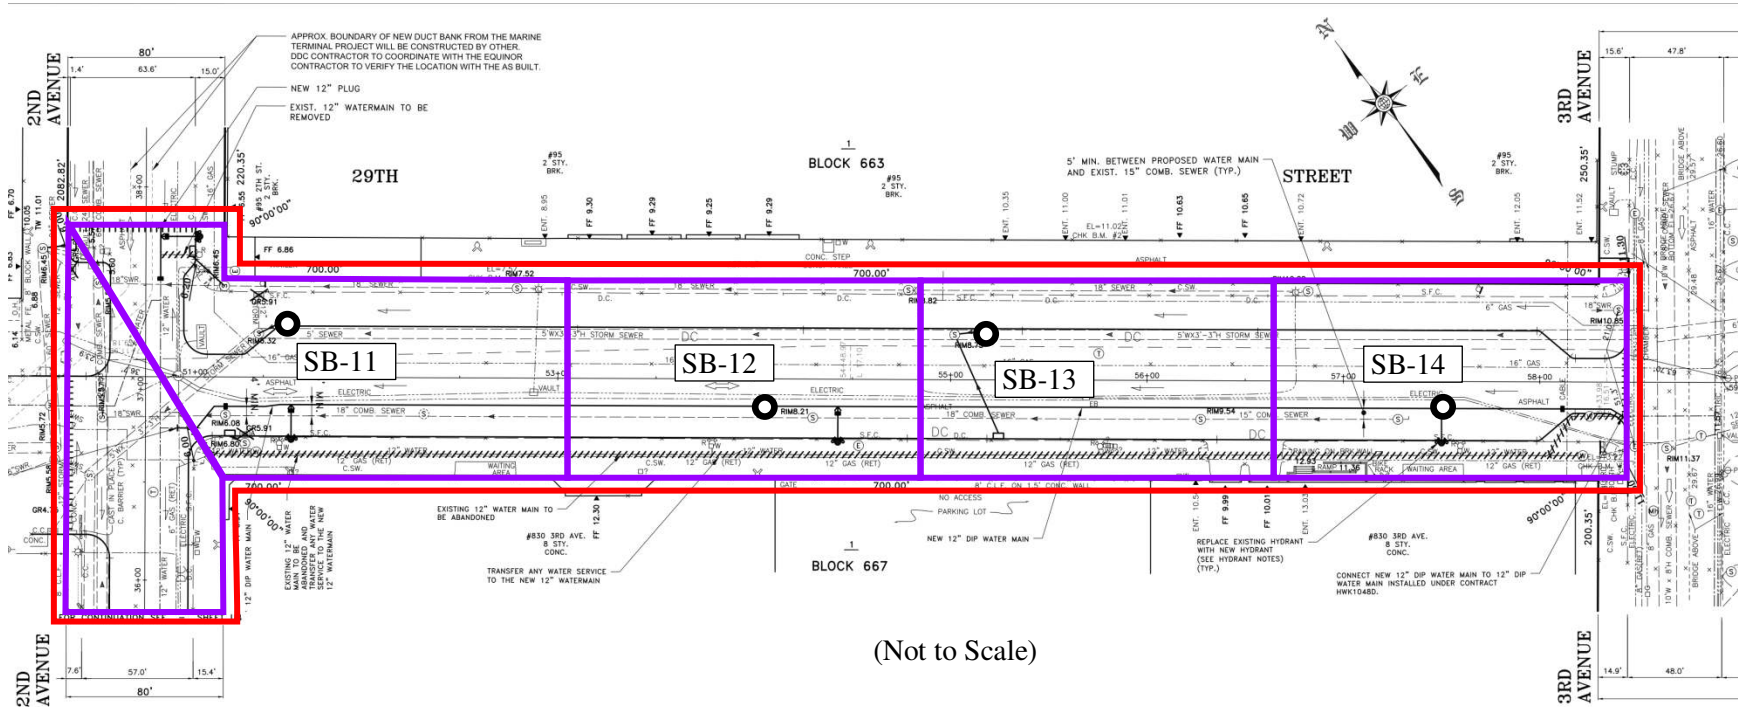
Soil Boring, Sample and Grid Location Plan
